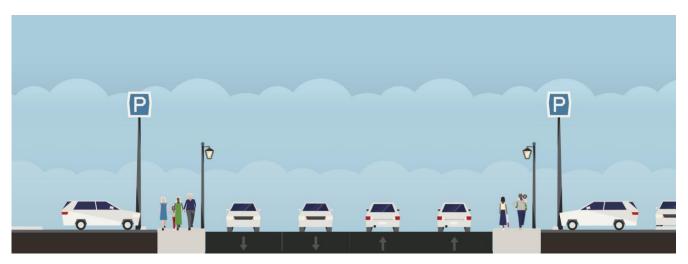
Stony Plain Road Facing East (West of 158 Street)
